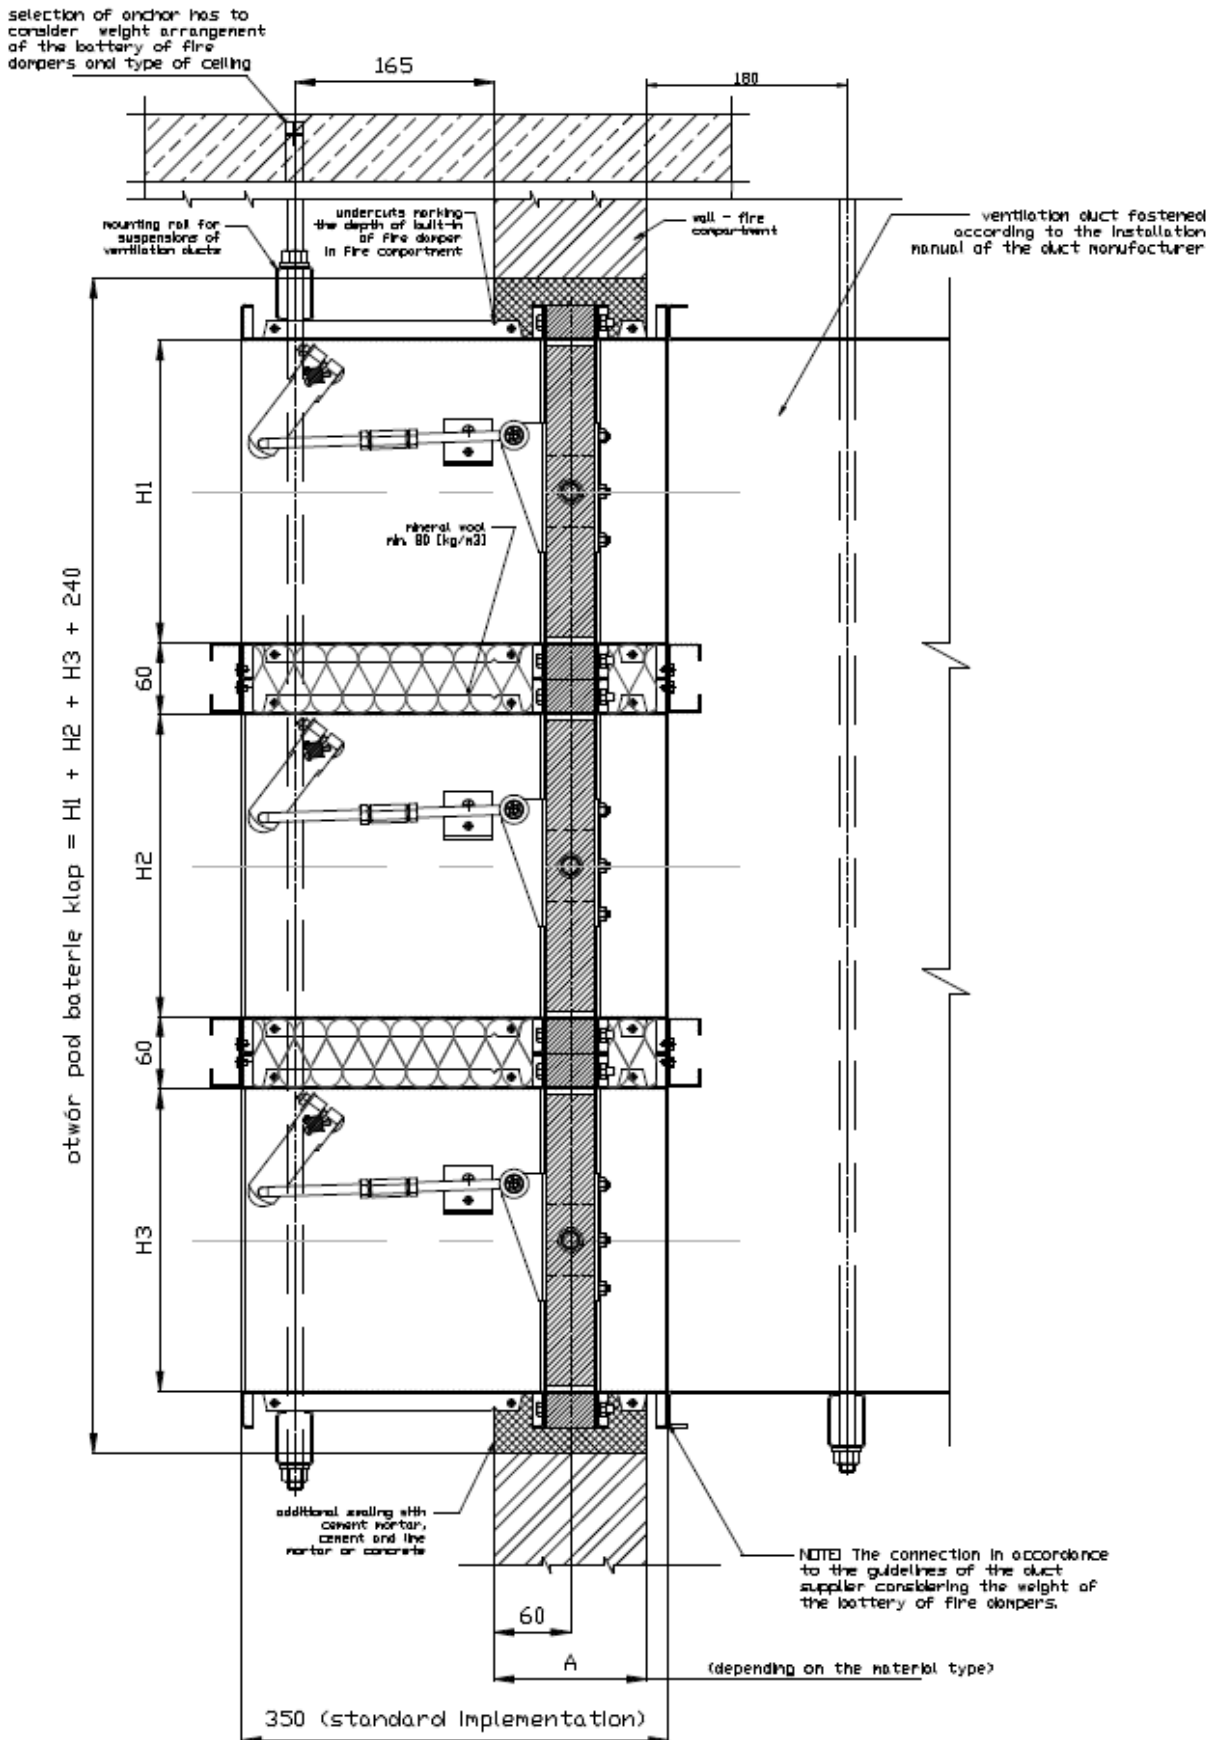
Installation of a battery consisting of three fire dampers KWP in vertical arrangement in rigid barrier – side view.
